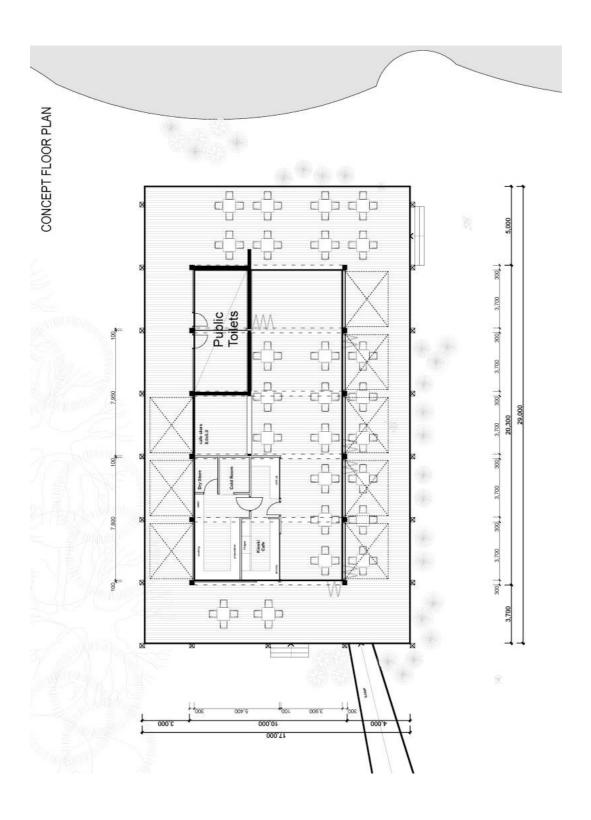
| Bilarong Reserve Food & Beverage Outlet Concept Plan The building footprint is 203 sqm with a total envelope including surrounding verandah of 493 sqm. The building includes toilets.
